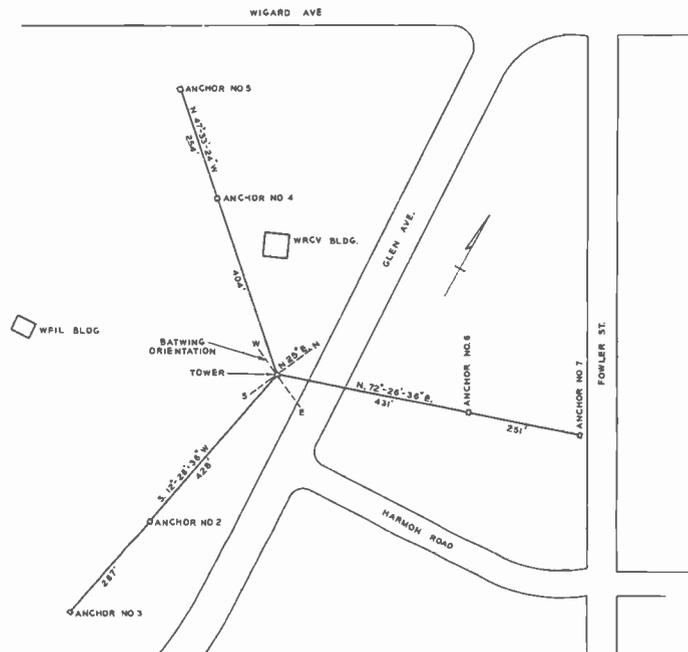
Layout of WFIL and WRCV buildings with respect to the tower is shown.
